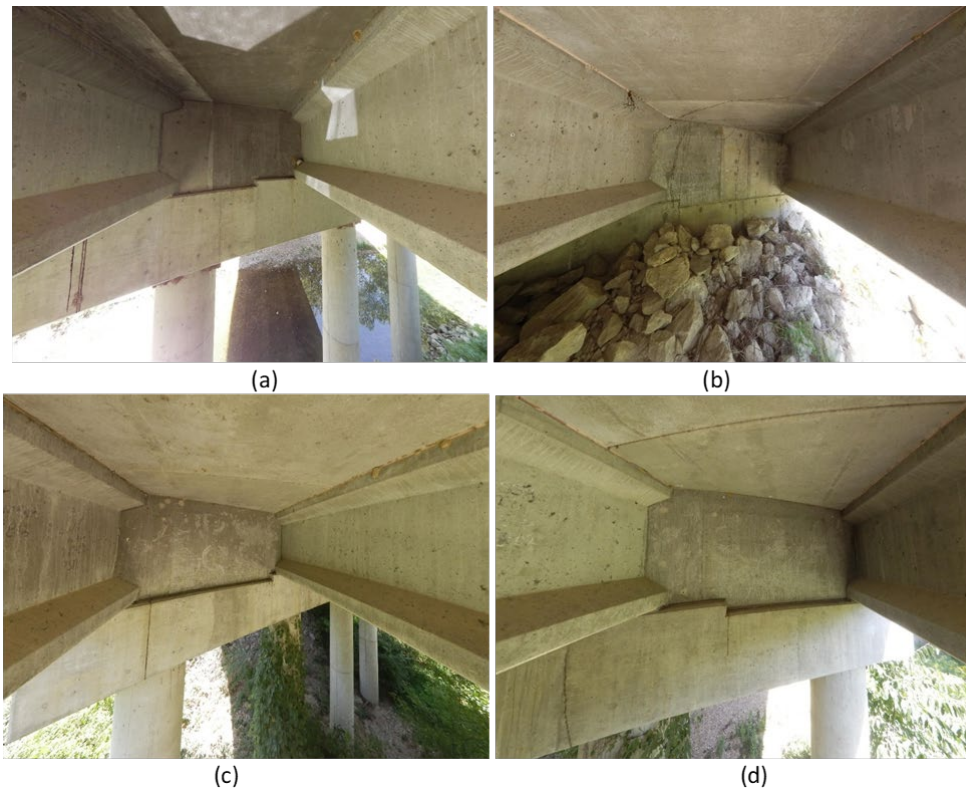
Missouri Prestressed Concrete Bridge A5805 (Elios 2)
